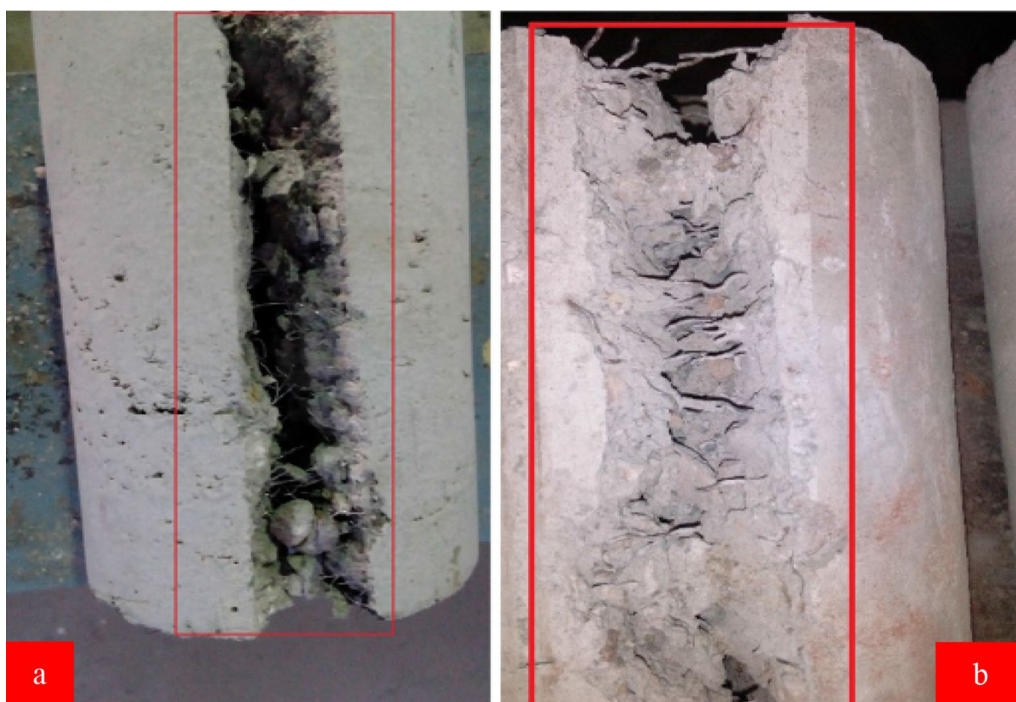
Failure of SF concrete under tensile loading (Simalti & Singh, 2021)
